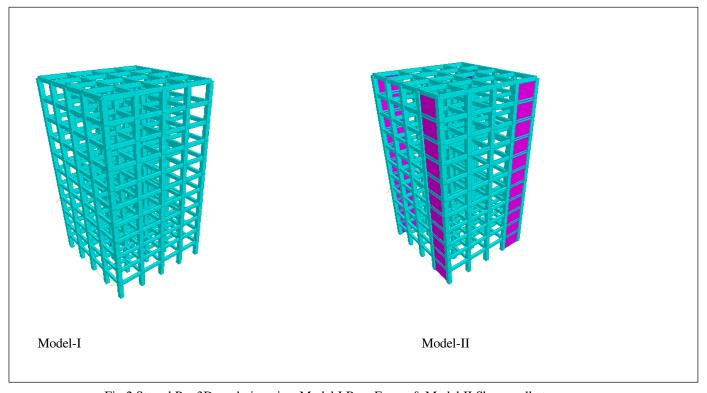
Staaad Pro 3D rendering view Model I Bare Frame & Model II Shear wall at corner
